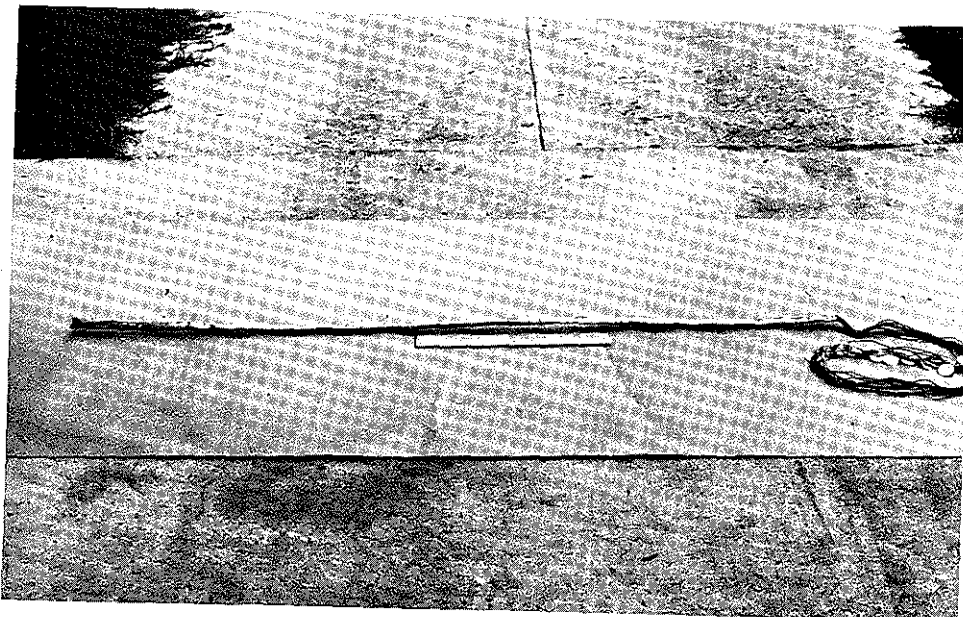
COMPLETED INSTRUMENTATION TUBE
